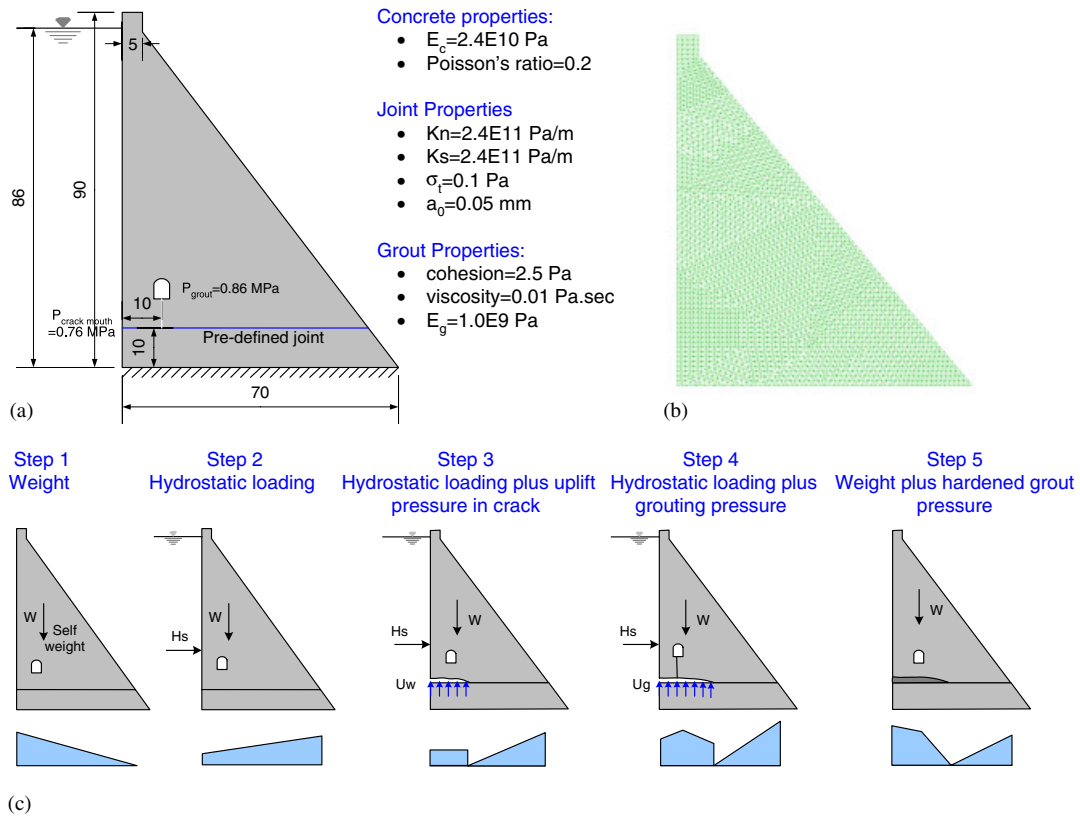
Case study, 90-m high-gravity concrete dam and loading steps: (a) 90-m-high dam; (b) UDEC mesh; (c) loading steps
